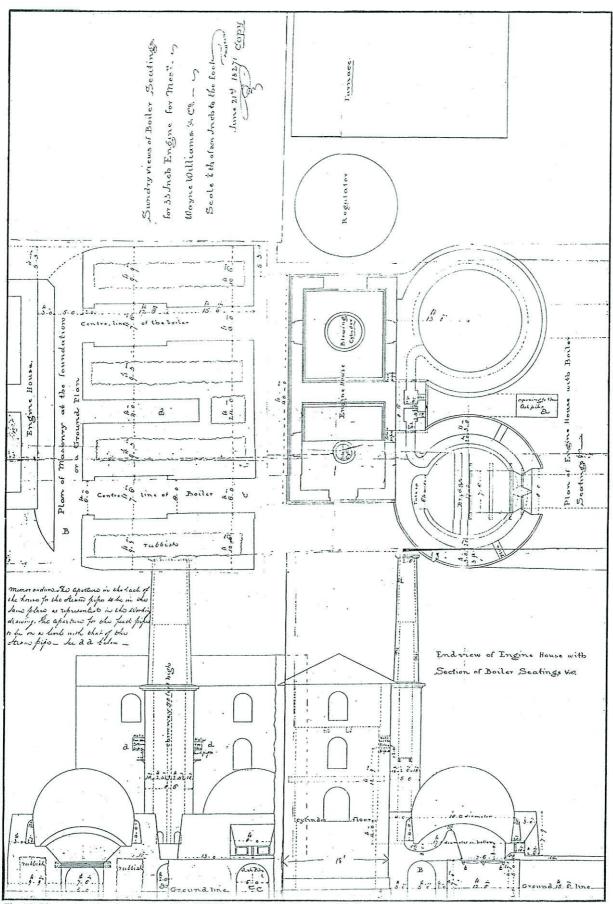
Plan and sectional elevation of the 1827 Blowing Engine House and Boilers (GAS D/D NAI M/200/1)
